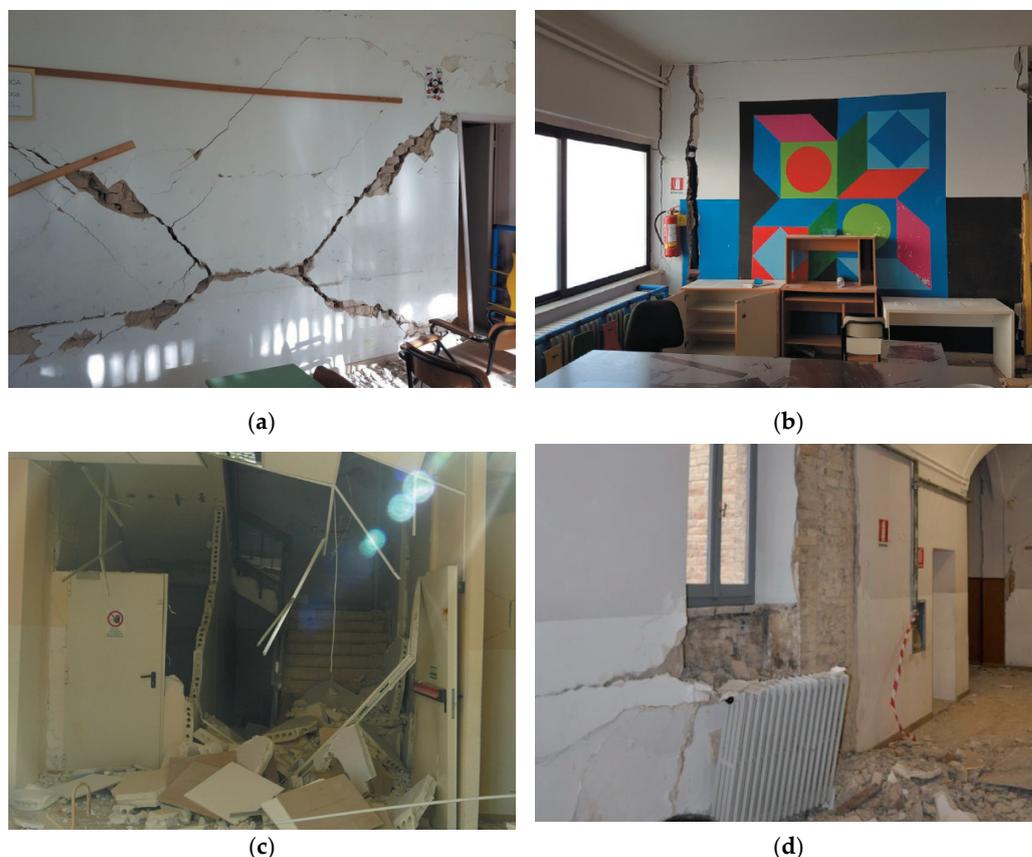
Damage to school buildings after 2009 L’Aquila earthquake: (a) diagonal and (b) vertical cracks in masonry infill panels; (c) collapse of internal partitions and damage to stairs; (d) damage to non-structural and heater elements (Di Ludovico et al. [7]).
